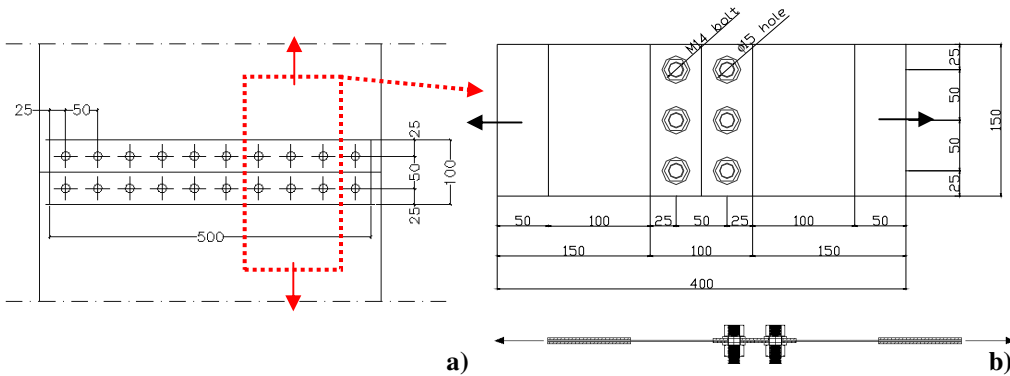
The connection among panels (a) and the tested connection specimen (b)
